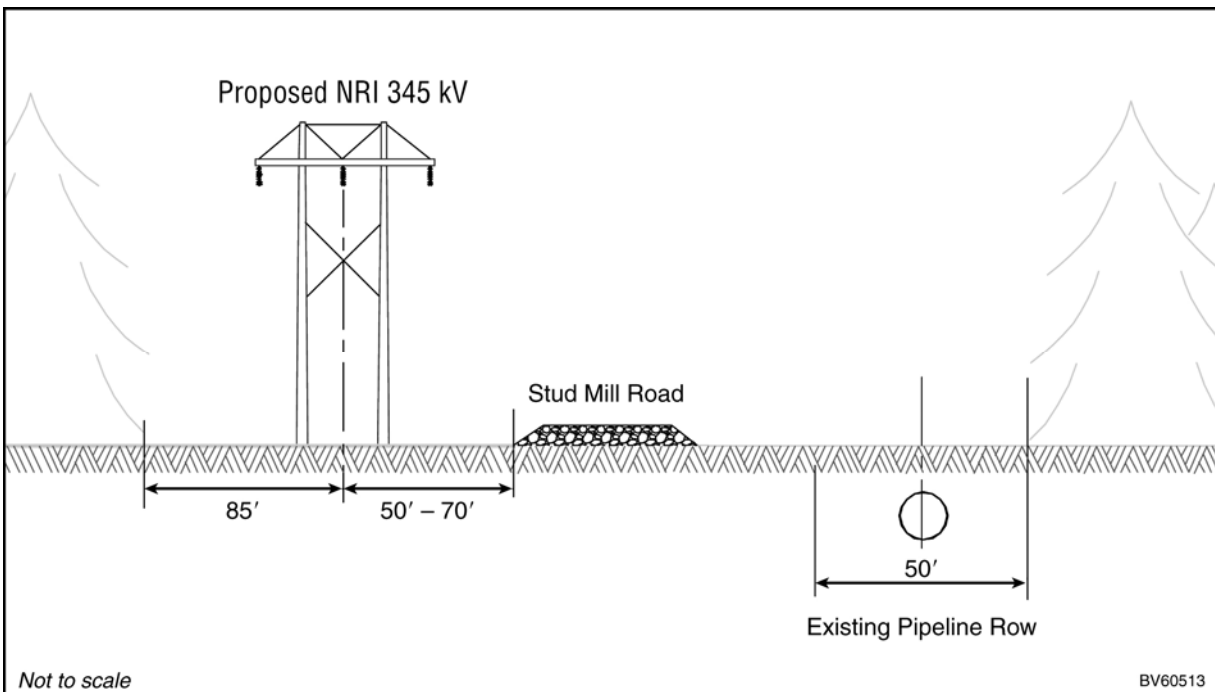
Placement of the NRI Adjacent to Stud Mill Road and the Gas Pipeline
